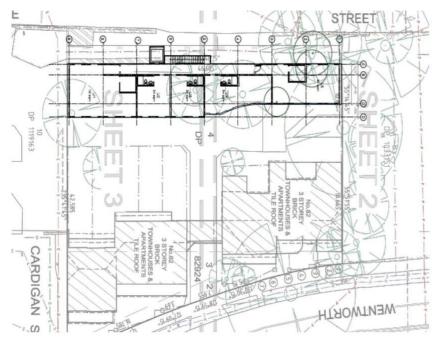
The Abraham's scheme retains and refurbishes the existing building on Wentworth Park Road and proposes a new building at the rear of the site (plan courtesy Hector Abrahams Architects)
